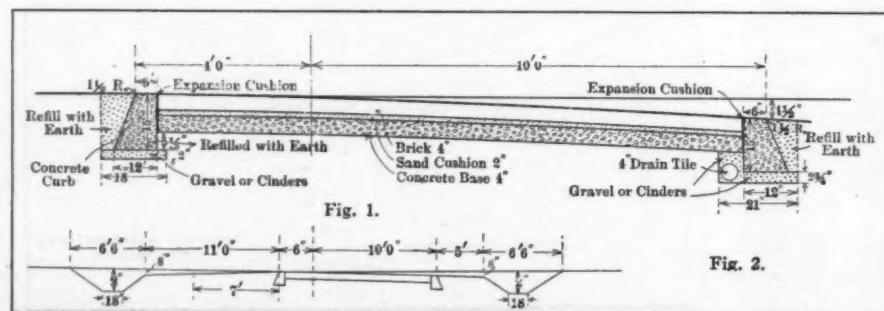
Section of a brick-paved street showing the details of construction. Fig. 2—Dimensional information related to Fig. 1
